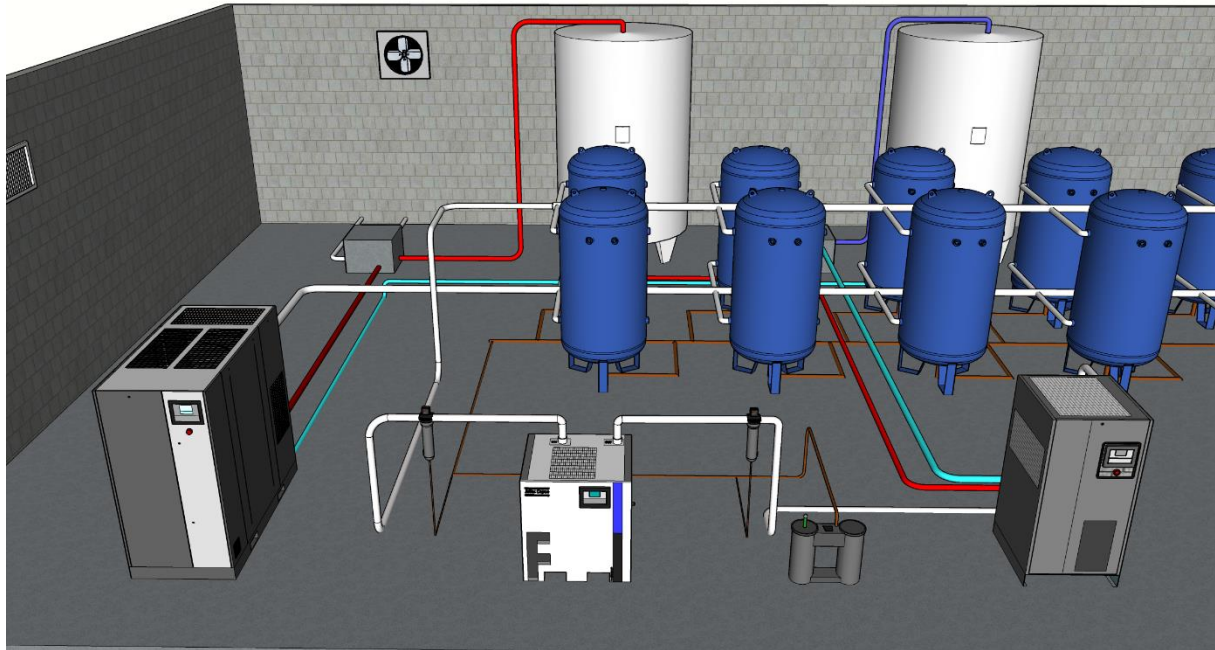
3D model of ideal prototype with focusing on power train module (compressor, dryer, air/oil separator and expander)
